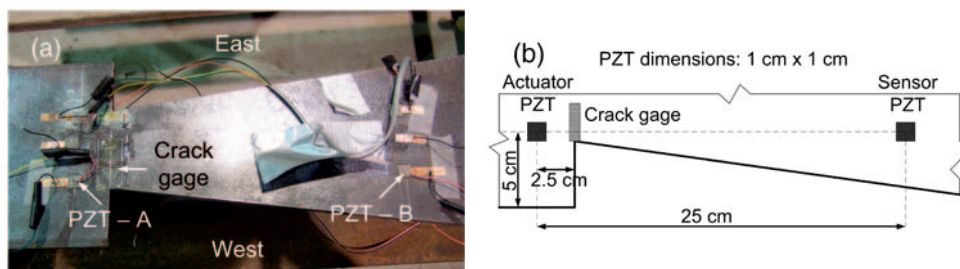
Part of the tension flange of the steel beam: (a) The notch, the PZT wafers and the crack gages (b) Schematic figure showing transducers and crack gage locations.
